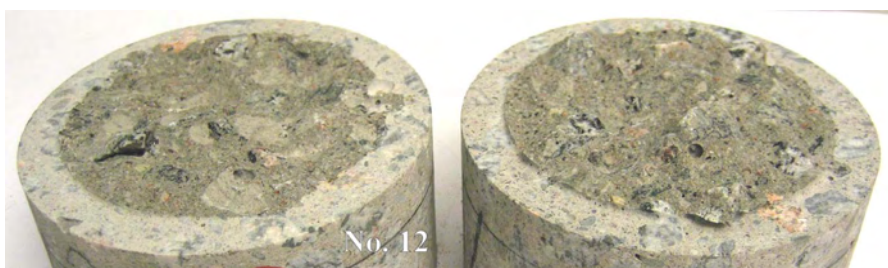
Photograph showing the failure surface for test No. 12 after fatigue test.
